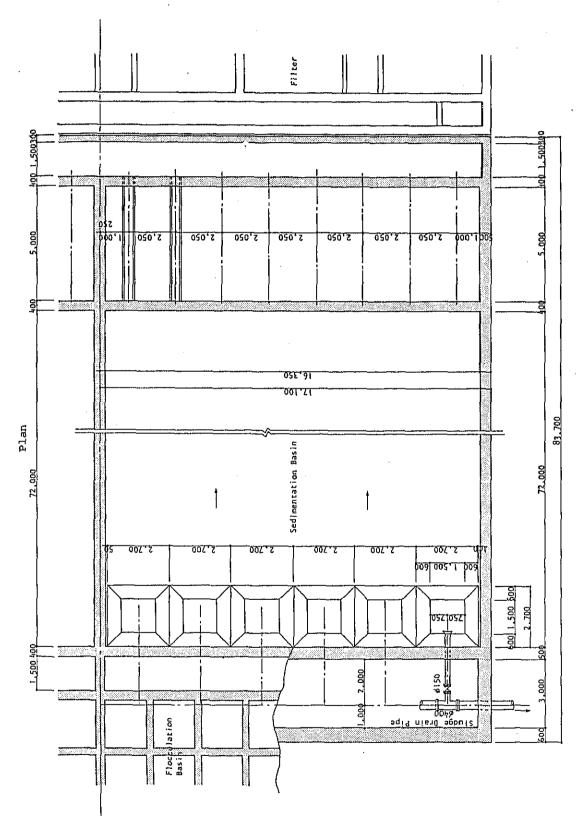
<u>SEDIMENTATION BASIN</u> (Northeast Plant)
